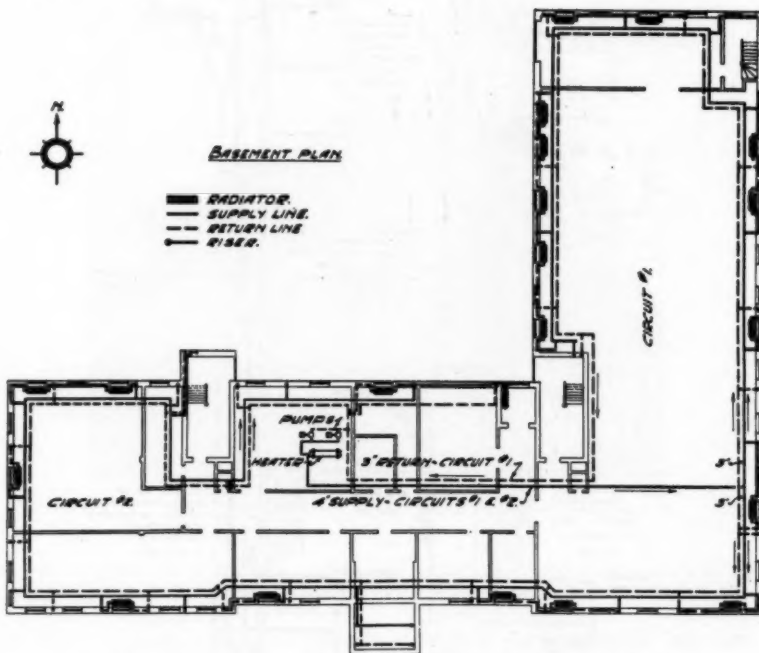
BASEMENT PLAN SHOWING ARRANGEMENT OF HEATING PLANT
